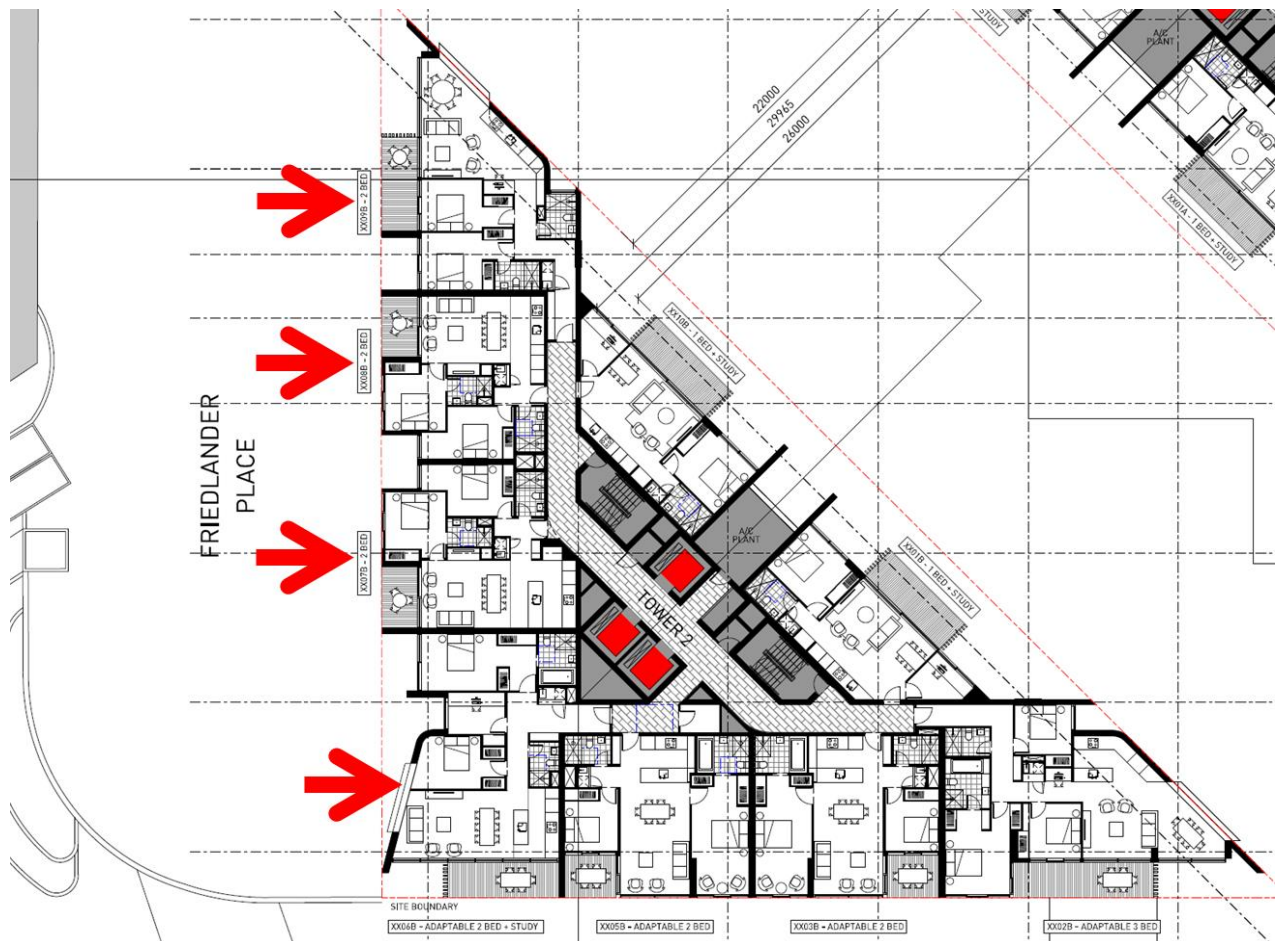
is a partial plan of a typical floor of that building, identifying the key units:
